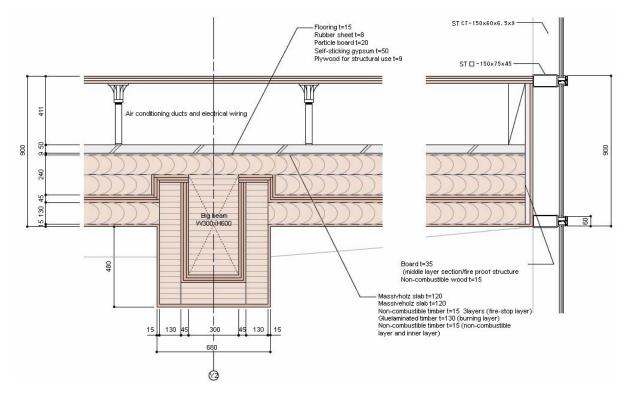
e - Detail: Beam and façade; Dimensions in [mm]
